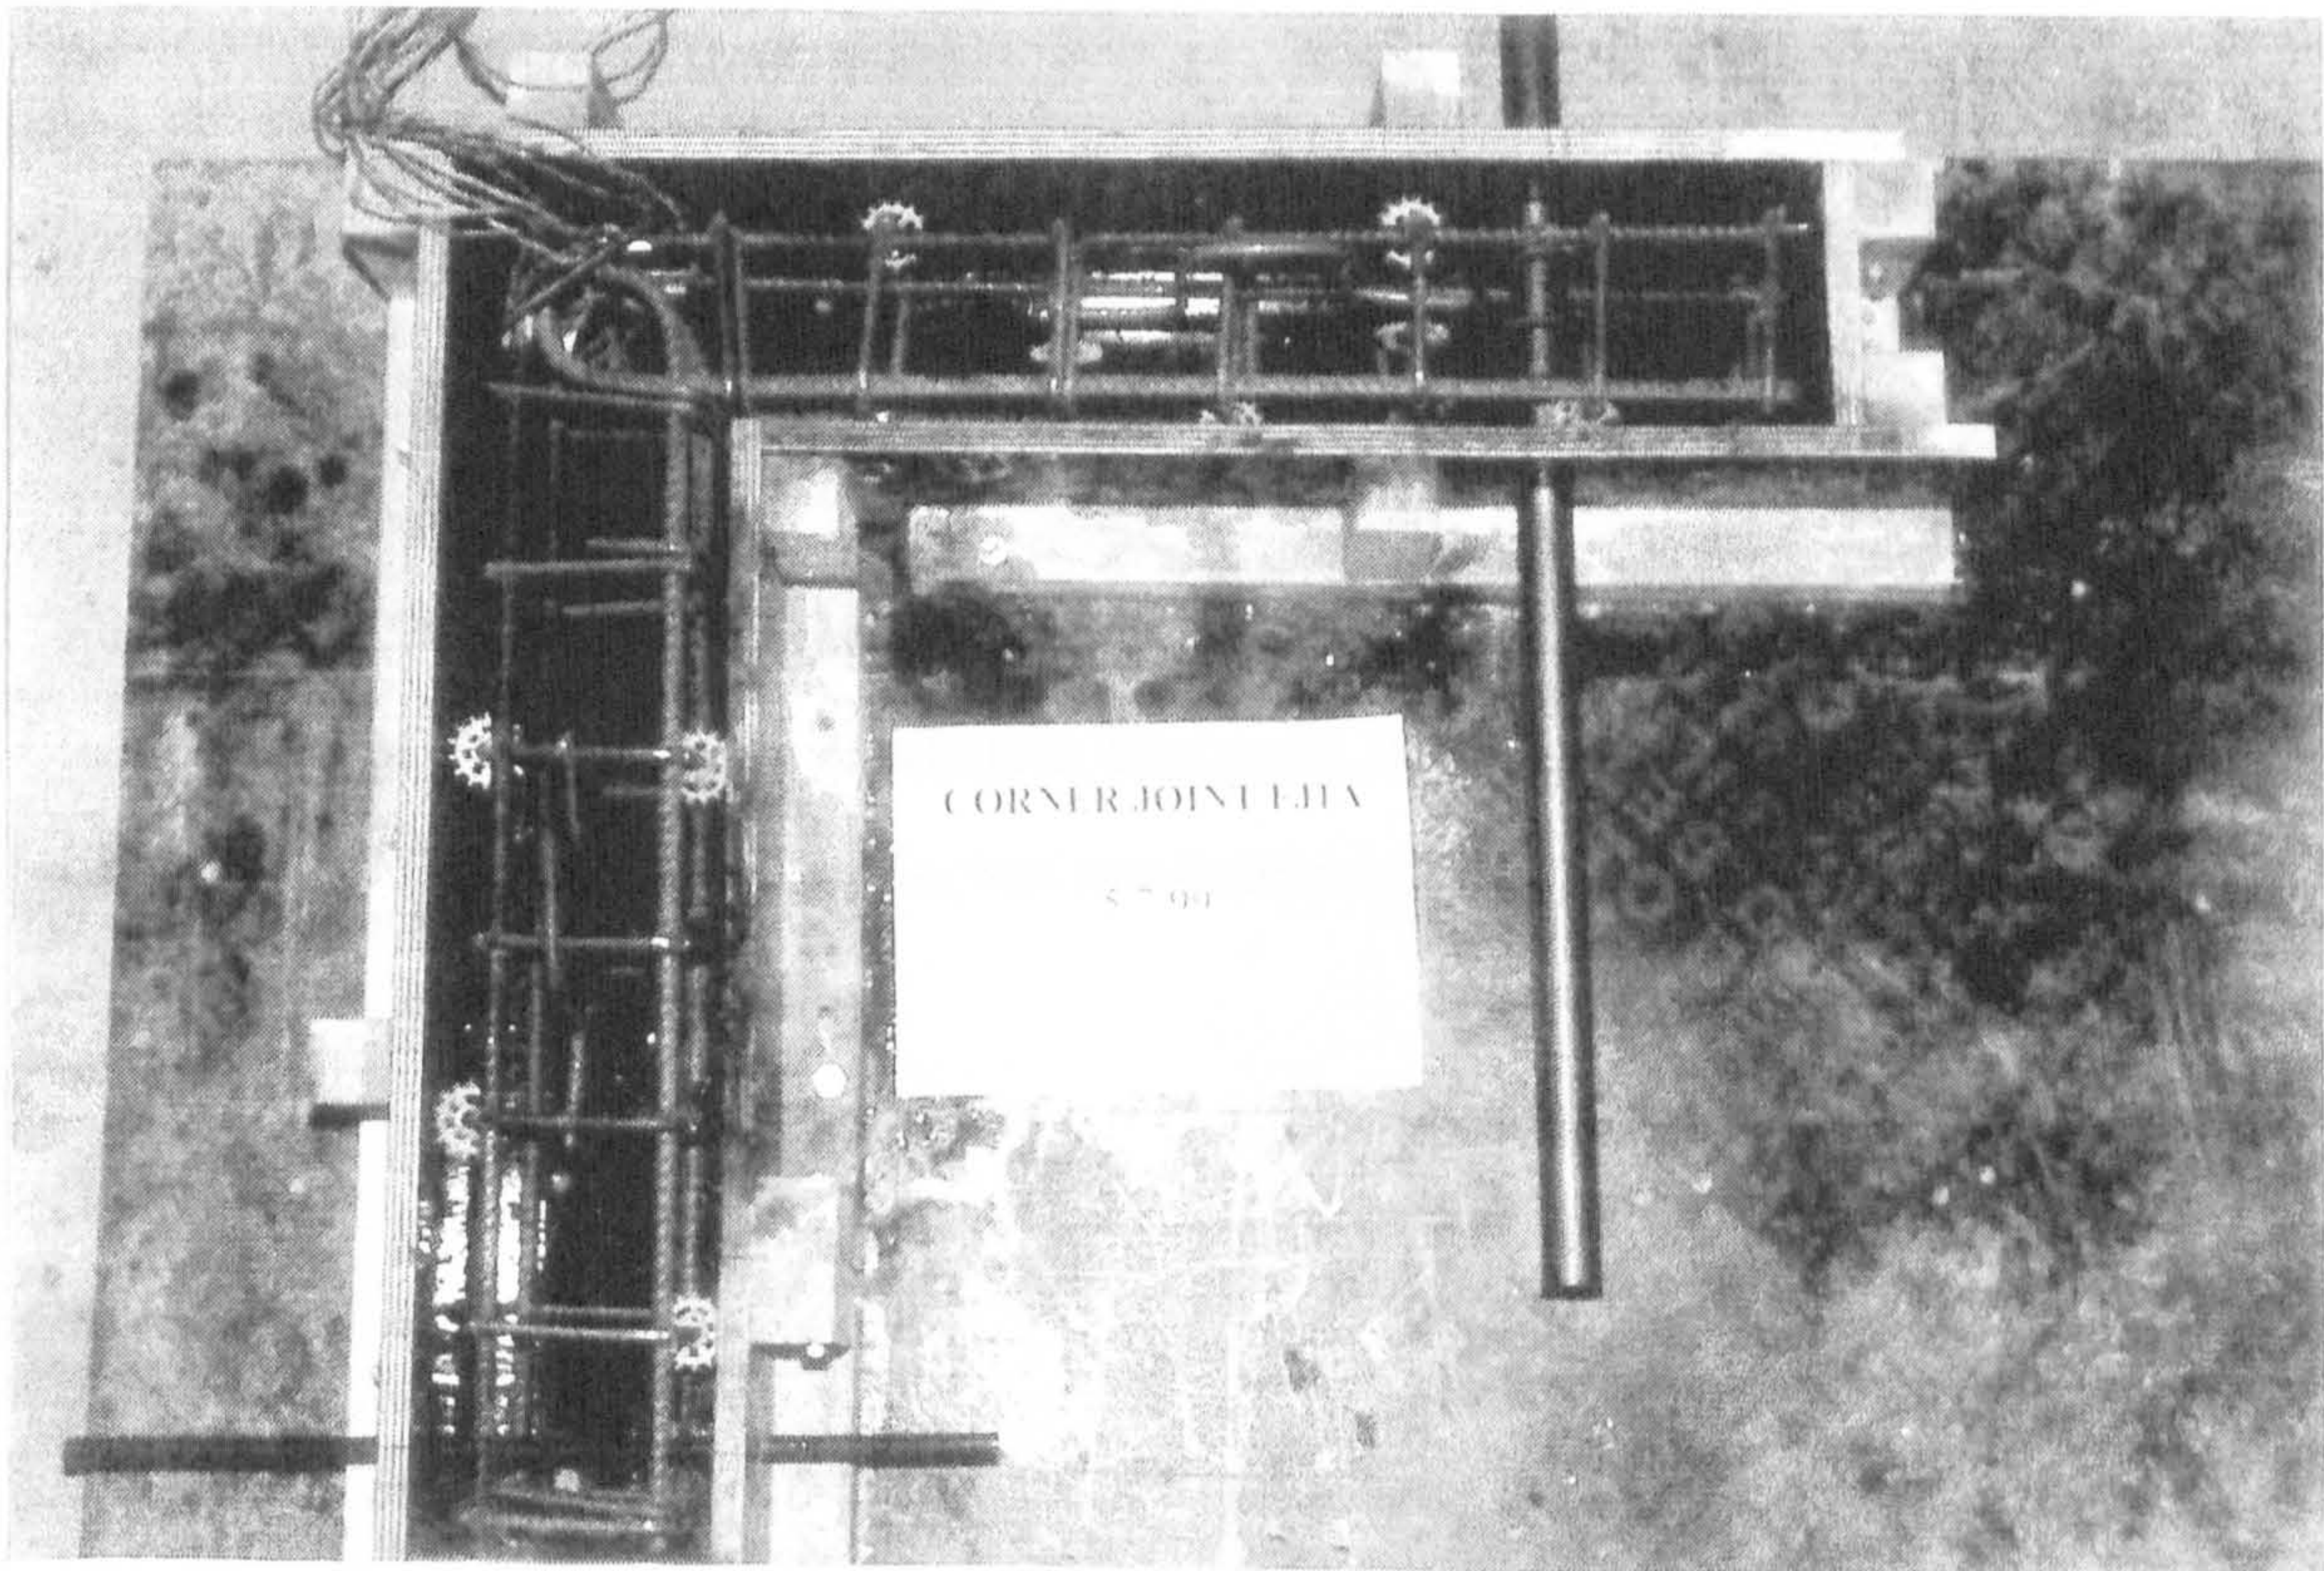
(ii) Corner FJ1A Reinforcement & Formwork
